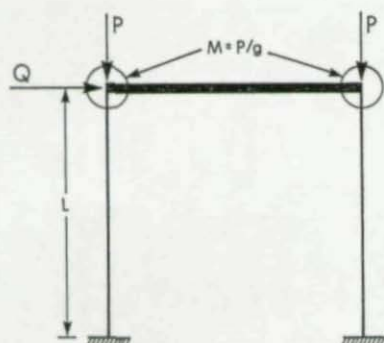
The model of a single story frame: A pair of columns connected by a rigid beam.
